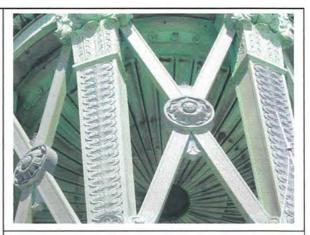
Detail of bronze lantern, looking northeast. Shows cross-bracing with rosettes, underside of lantern, and access hatch.
